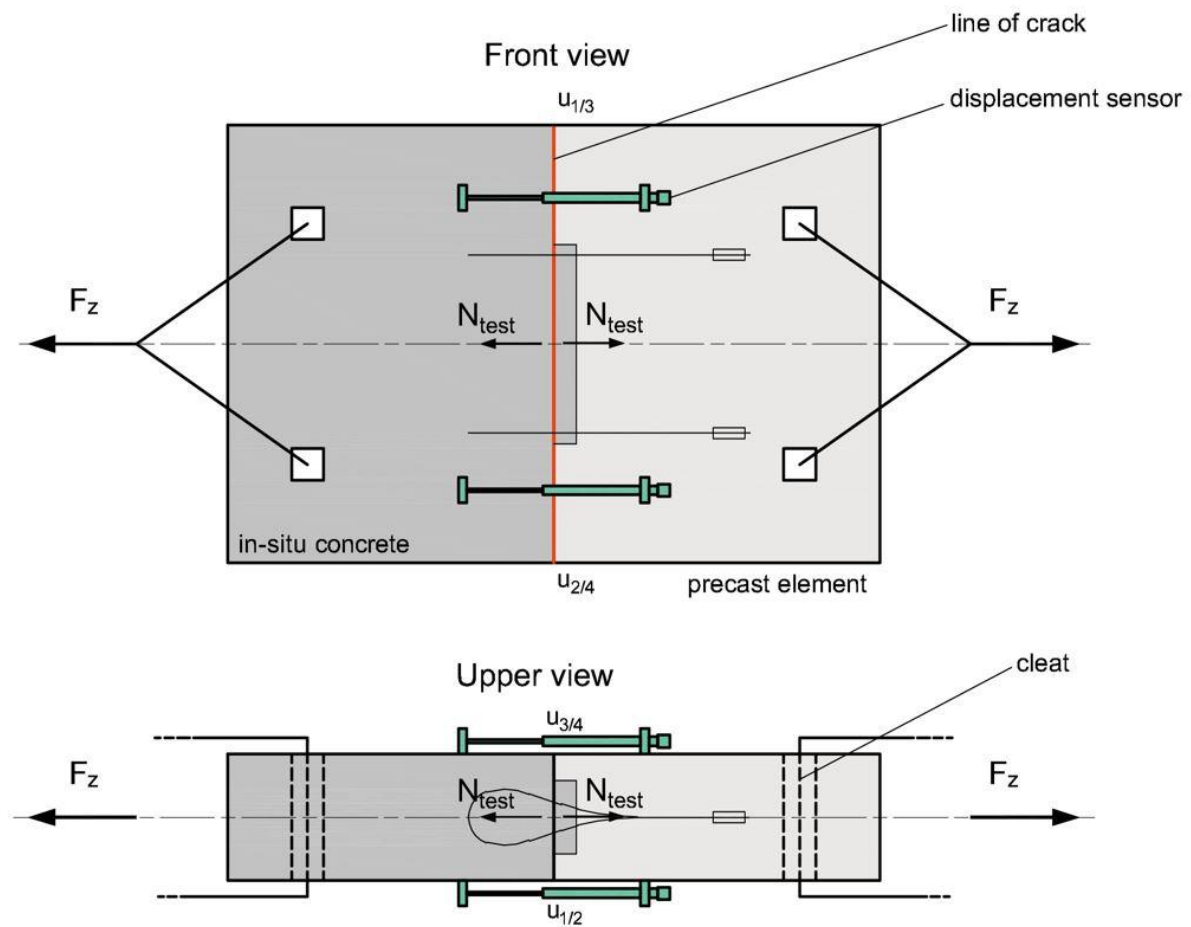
Test setup for connections with in-situ concrete elements
